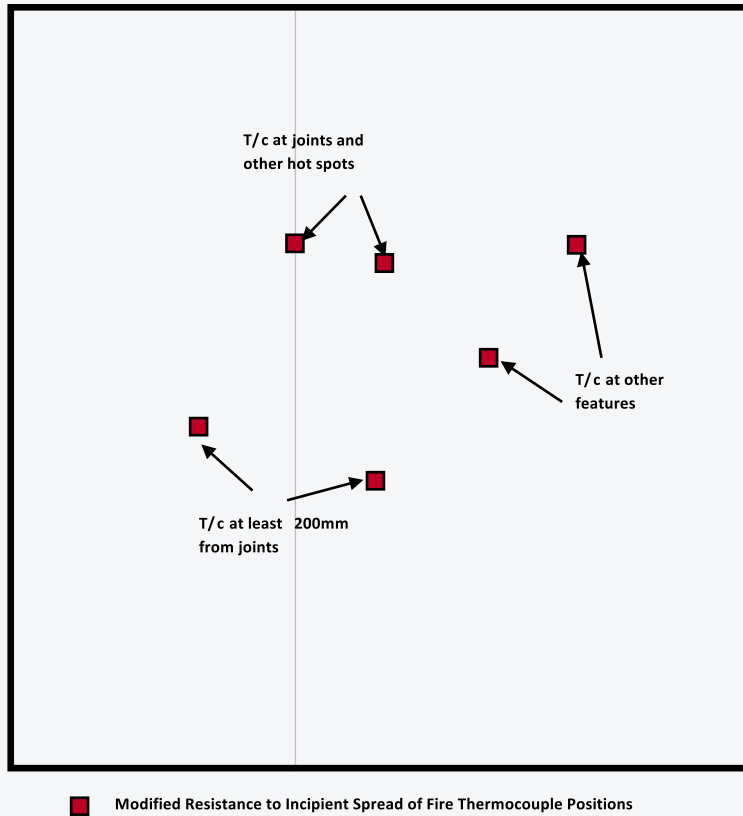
Elevation of a wall showing modified RISF thermocouple positions.
